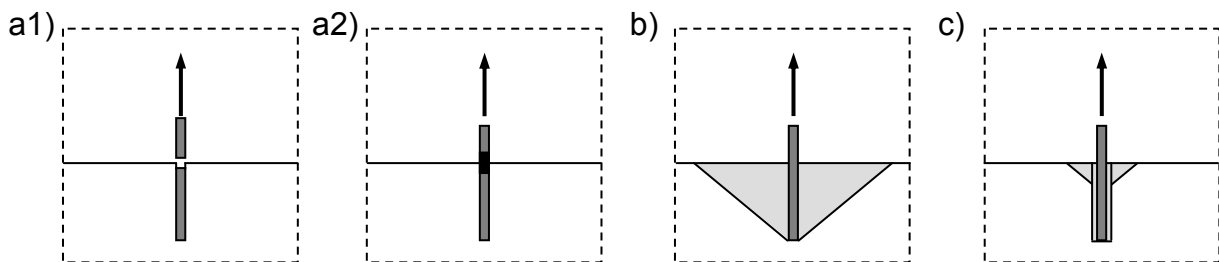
Individual bonded anchorage: a1) Steel failure mode; a2) Yielding failure mode; b) Concrete breakout failure mode; c) Pullout failure mode
